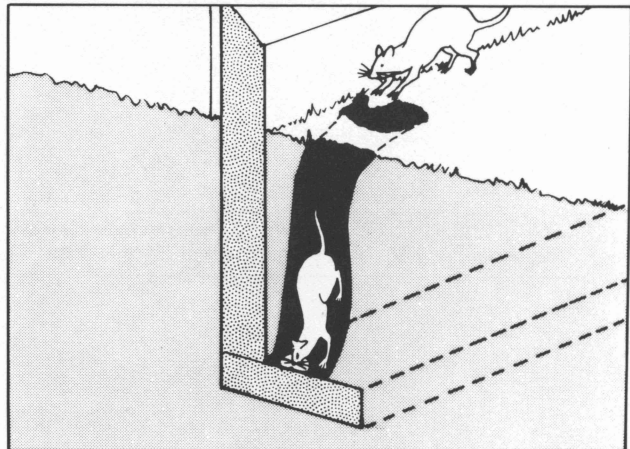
Concrete can be used to prevent rats from burrowing under foundations.
